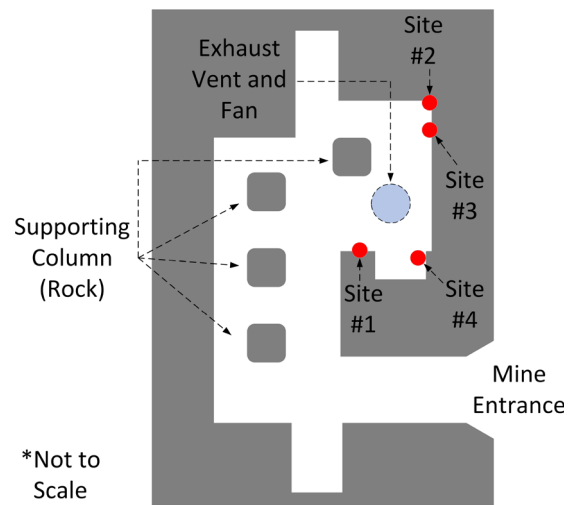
Layout of confined space testing sites. The test site included an overhead exhaust vent and fan, multiple supporting rock columns, and multiple alcoves, providing a test area with complex geometry
